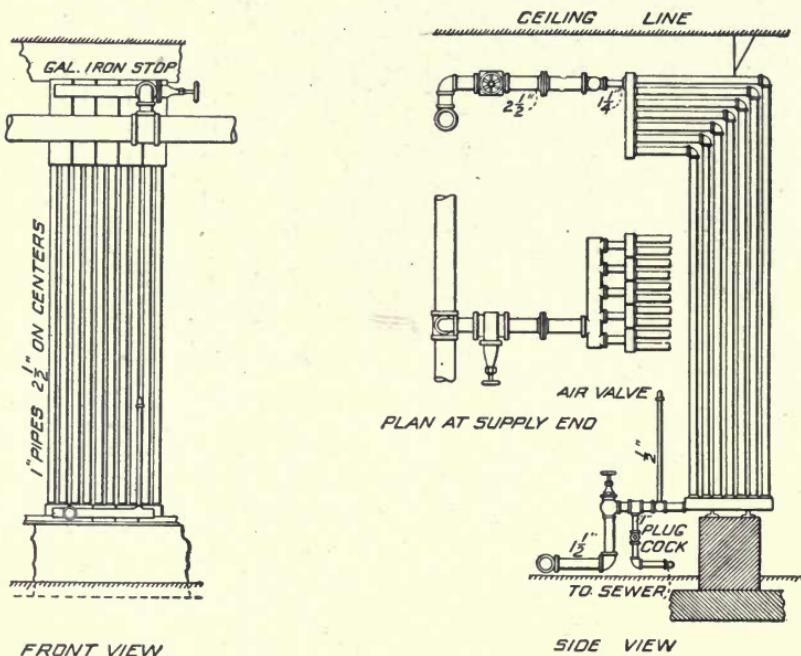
Heater Especially Adapted to Ventilation where Air does not Have to be Heated above 70 to 80 degrees F.
